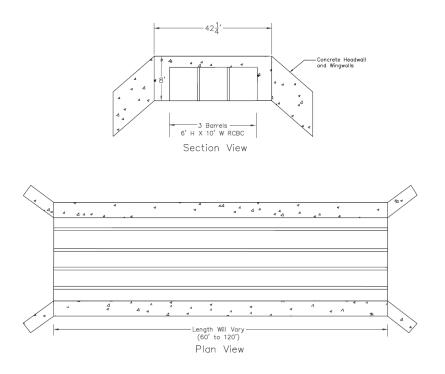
Typical Canal Road Crossing Structure – 500 cfs Canal
